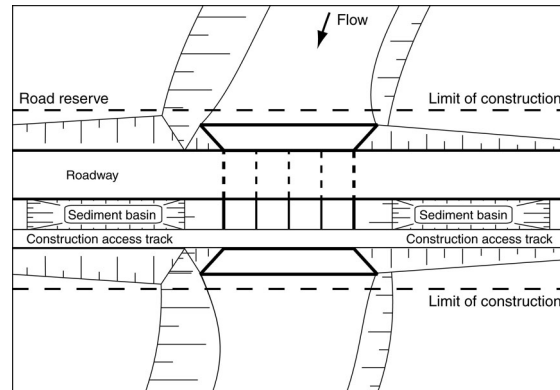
Stage 7: Finish culvert and construct half of the roadway slowly backfilling the Sediment Basins
